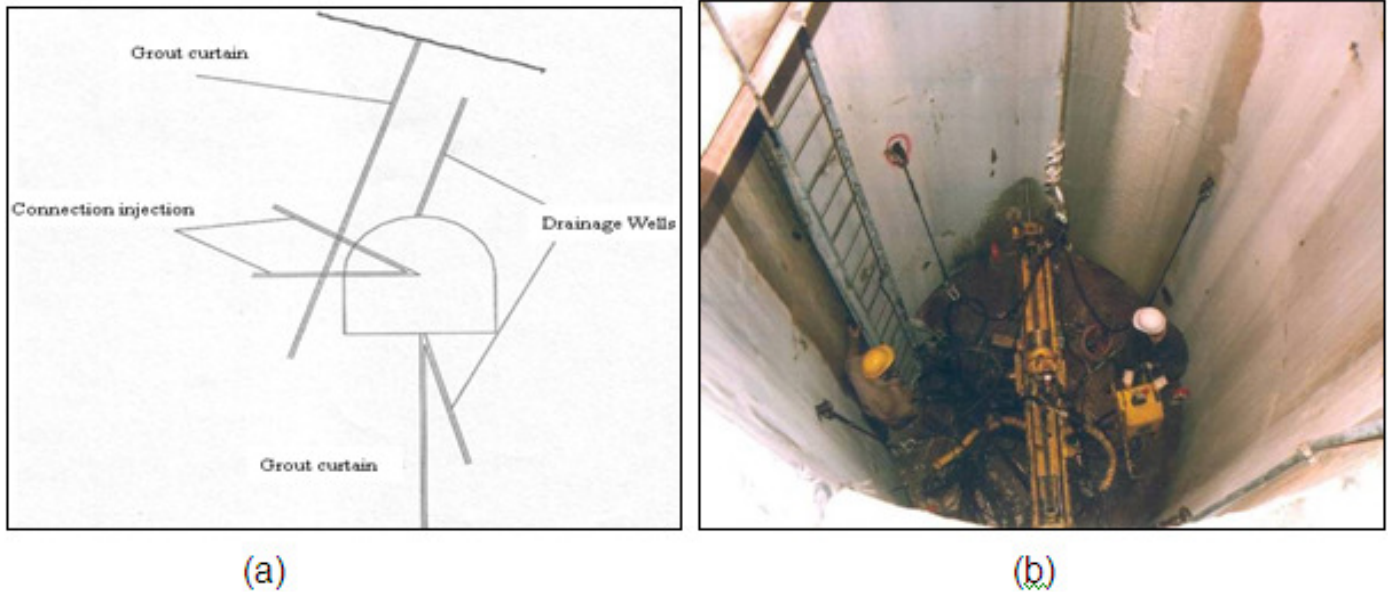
Grouting (a) and drainage wells (b) within the gallery.
